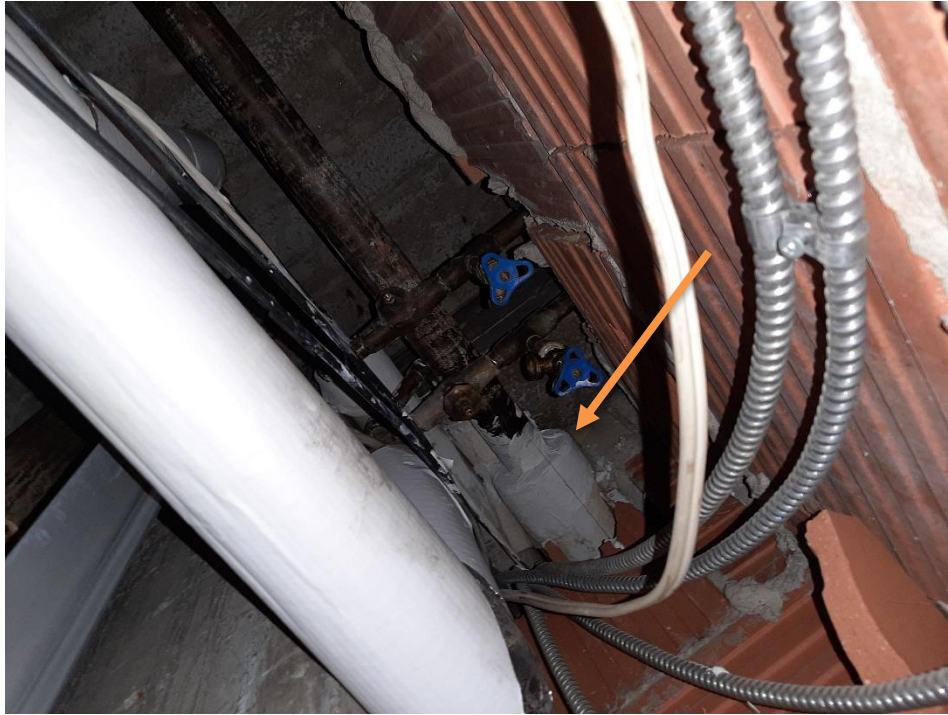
Asbestos-containing sweatwrap in east wing pipe chase in the basement of the building.
